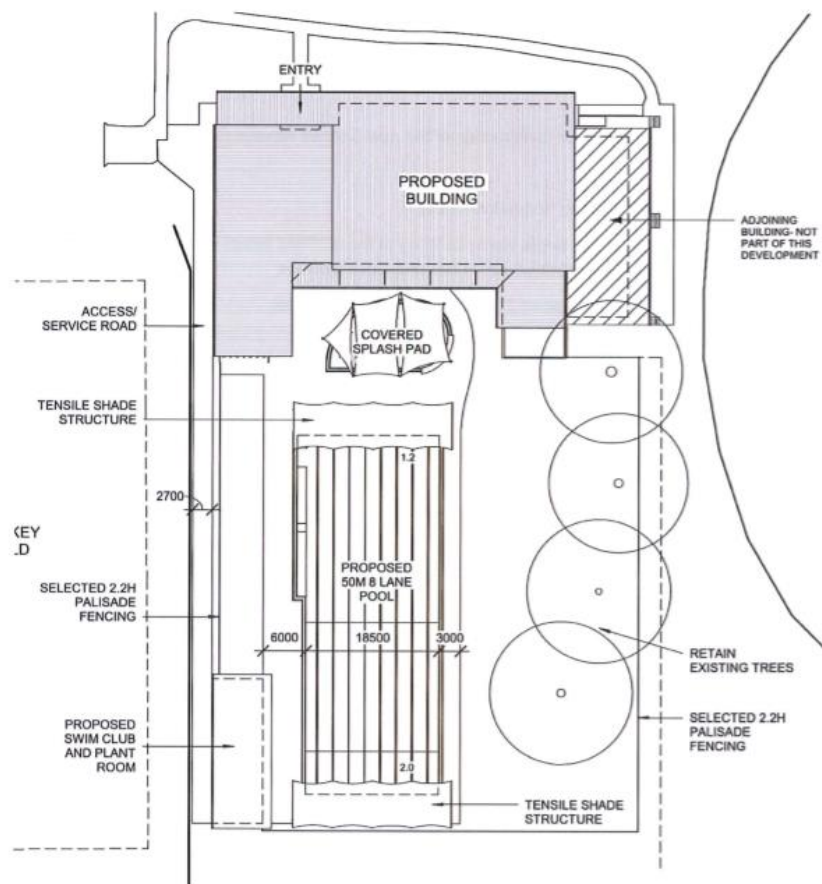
Proposed site plan for the Corowa Aquatic Centre
